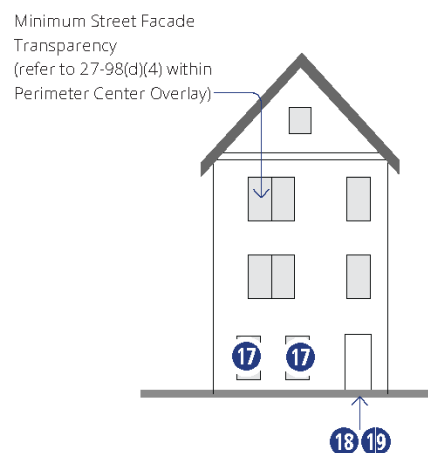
Detached House Building: Street Facade Design Requirements
